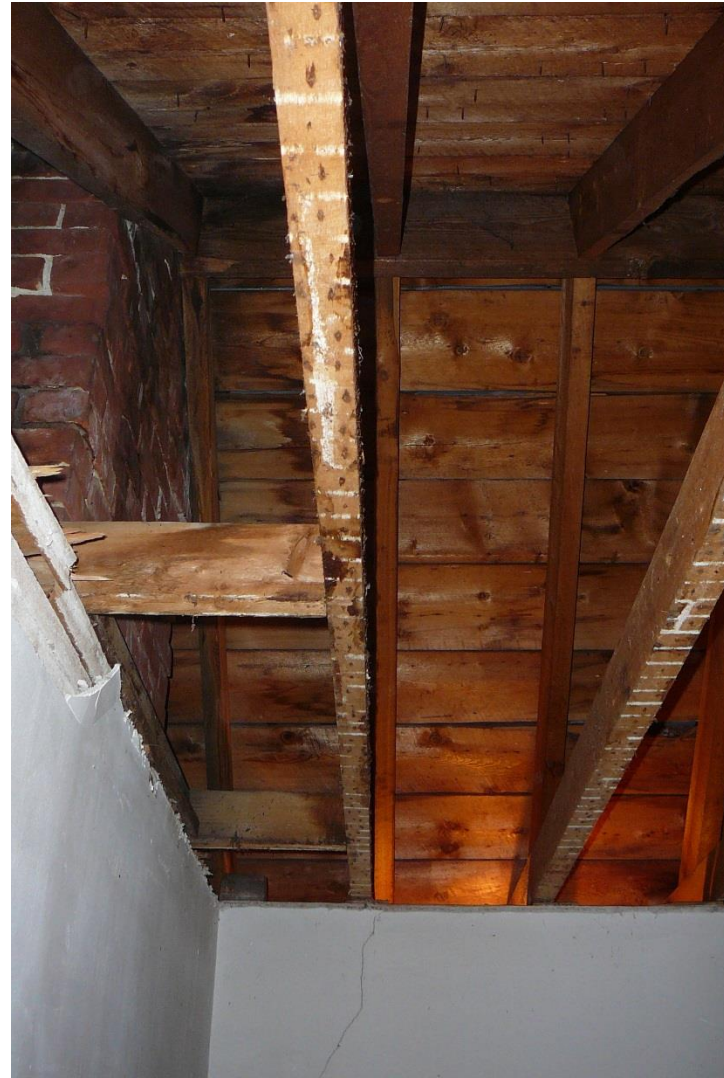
Attic floor roof structure, stair hall (A1) view up above stairway (Quinn 2017).
